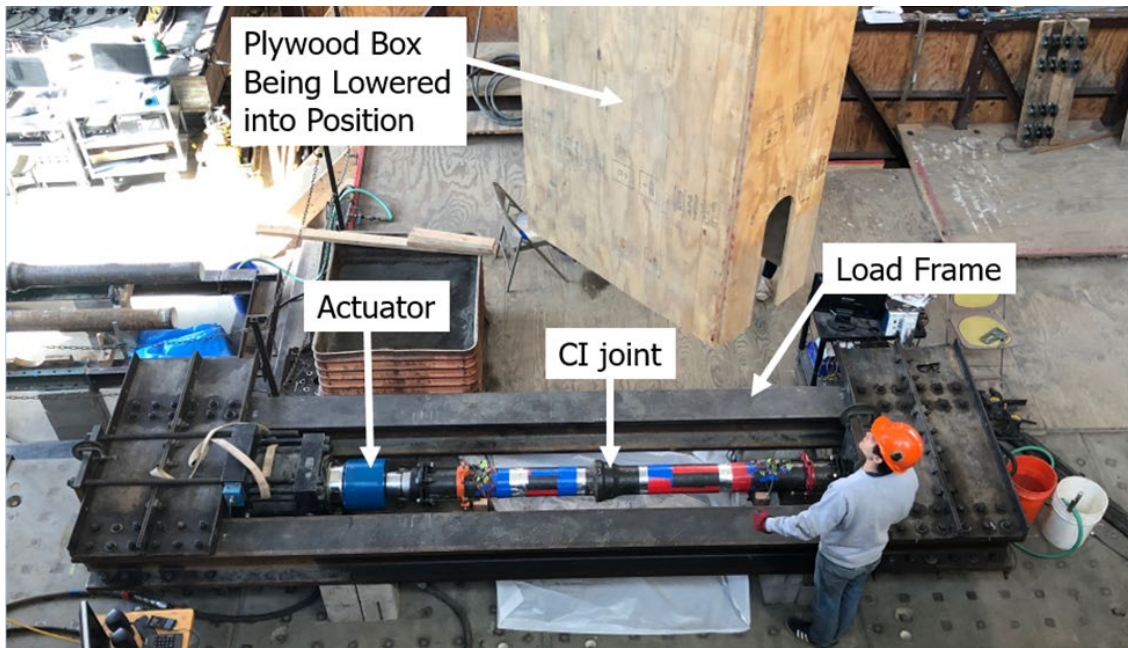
Direct Compression Jointed Pipe Specimen in Load Frame
